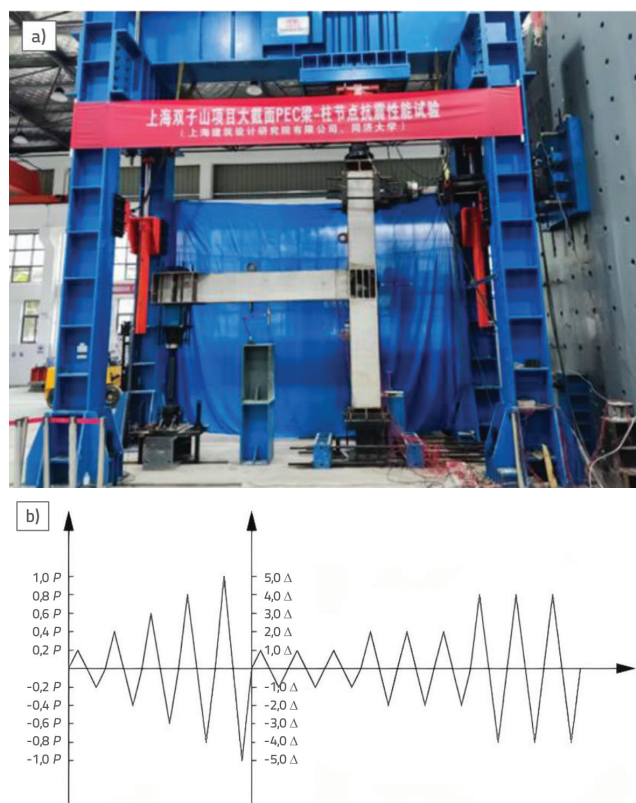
Test loading: a) Loading device; b) Specimen loading system
